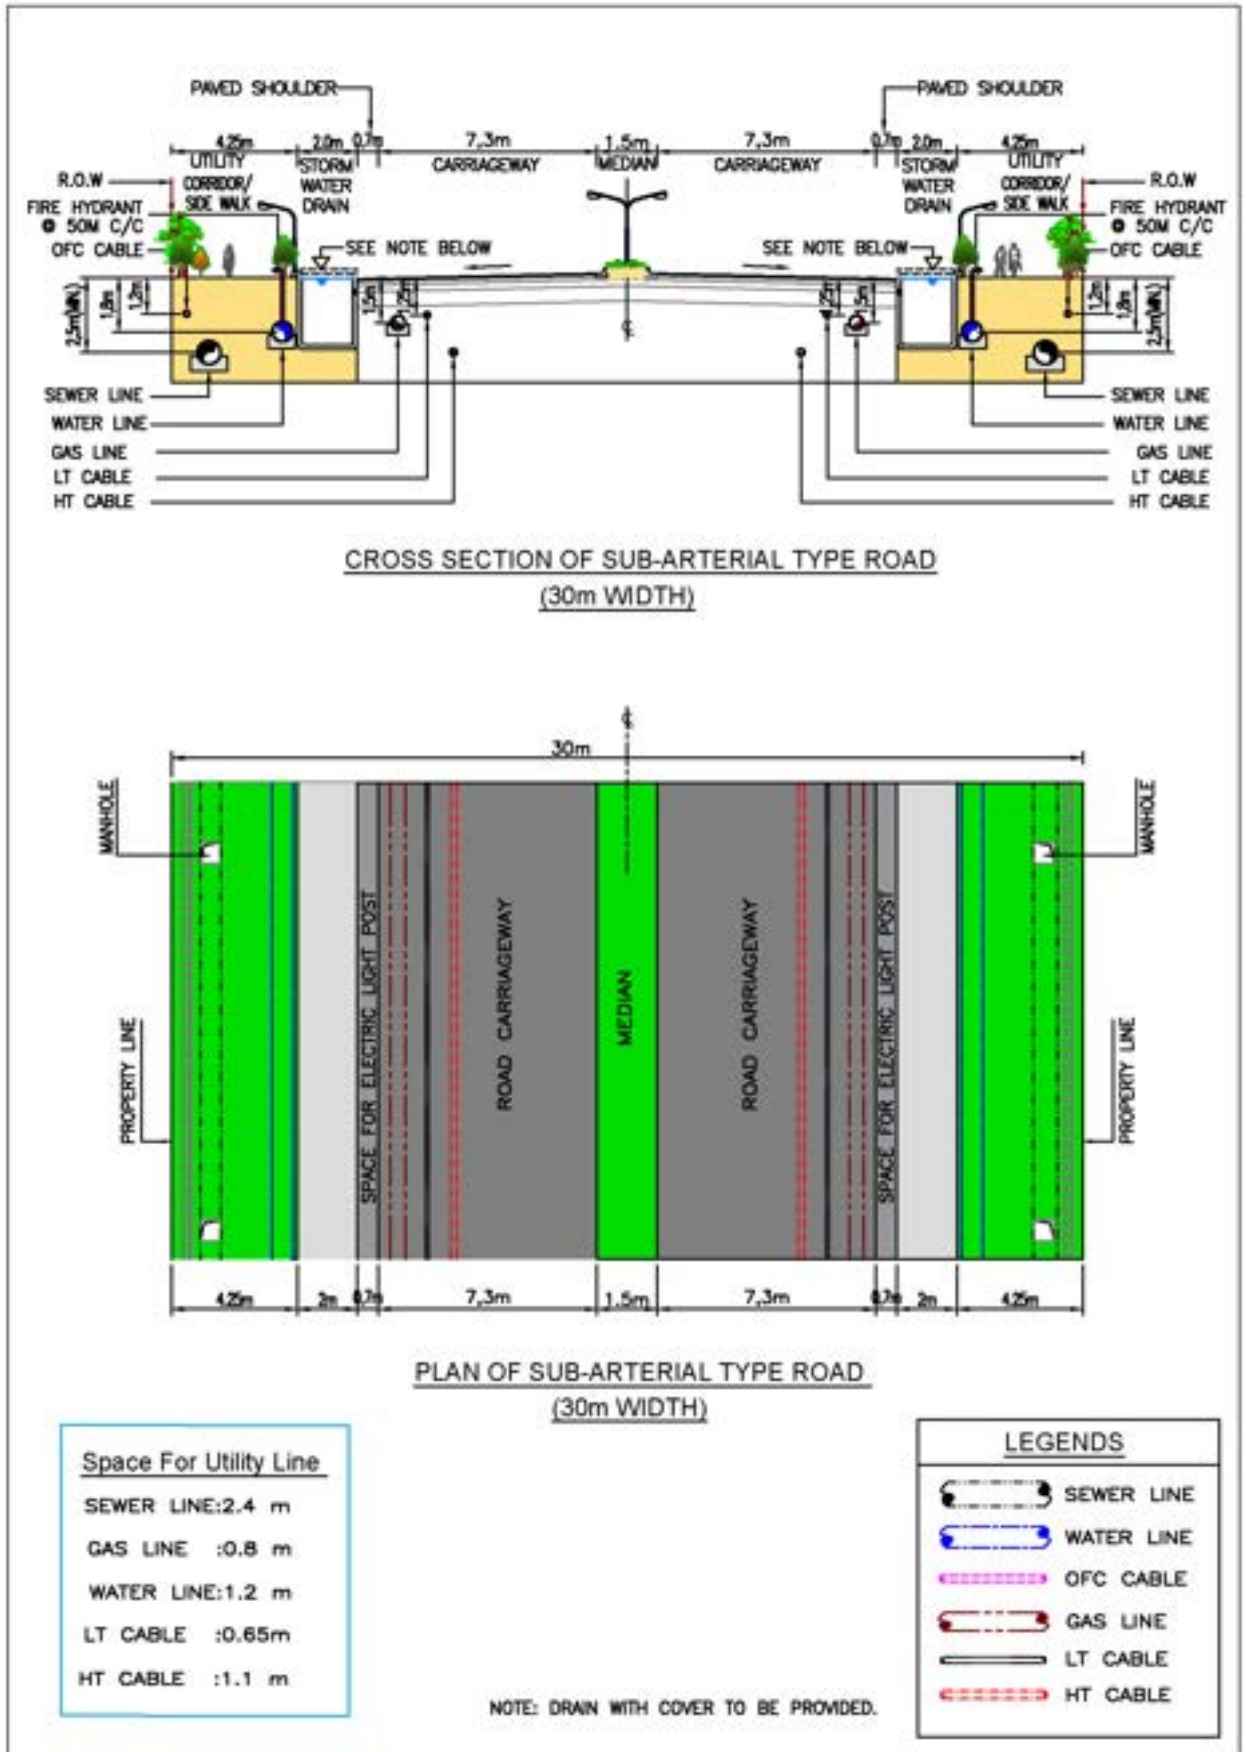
Cross section and Plan of 30m ROW Sub-Arterial Type Road
